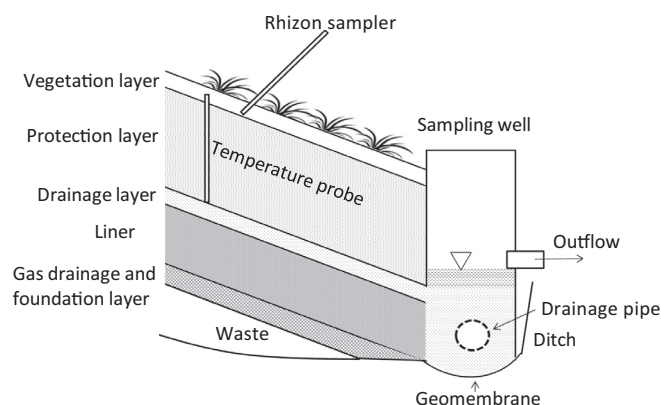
Cross section of the landfill cover test area with measurement equipment.
